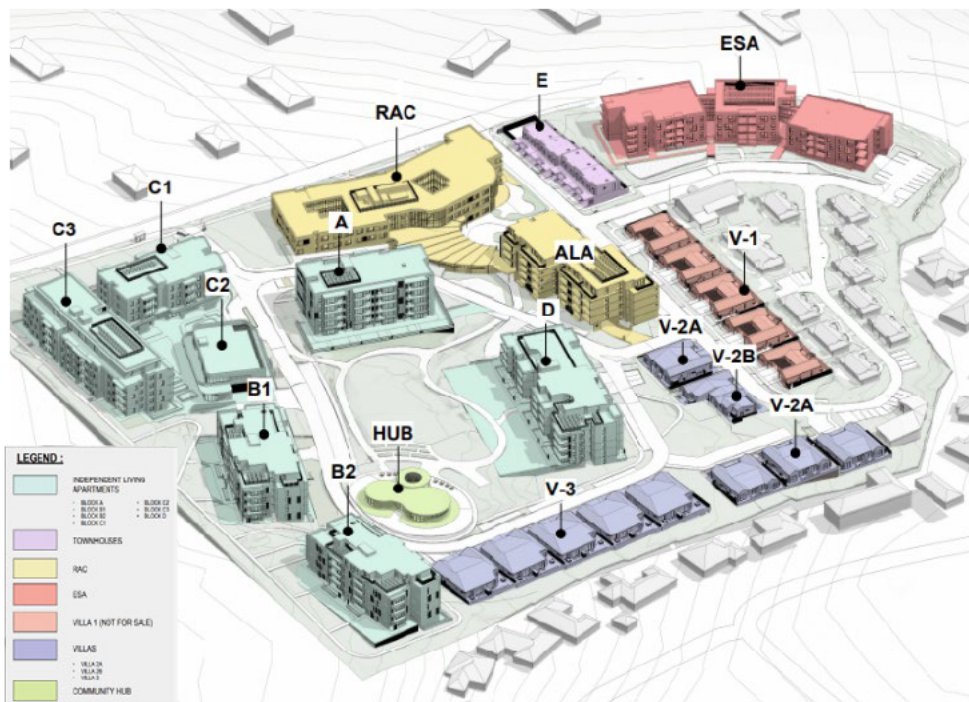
3D diagram of the overall development masterplan (Source: Masterplan, prepared by Thomson Adsett)
